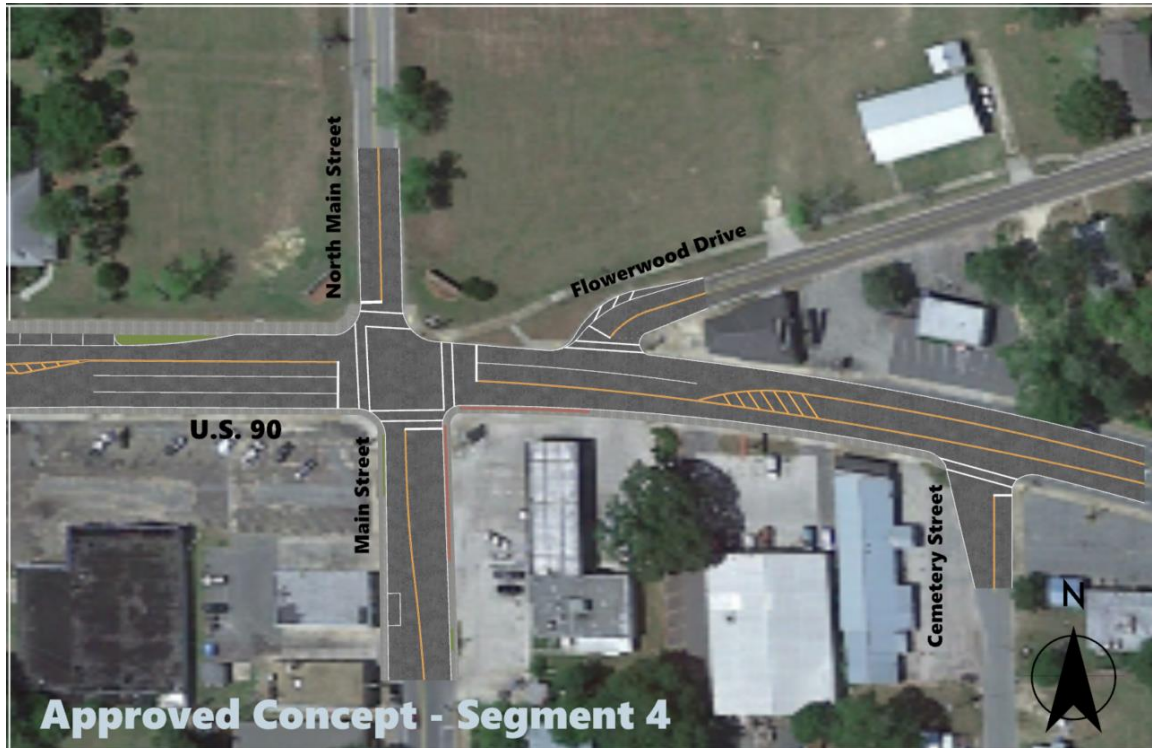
Segment 4 – East of Madison Street to Cemetery Street
